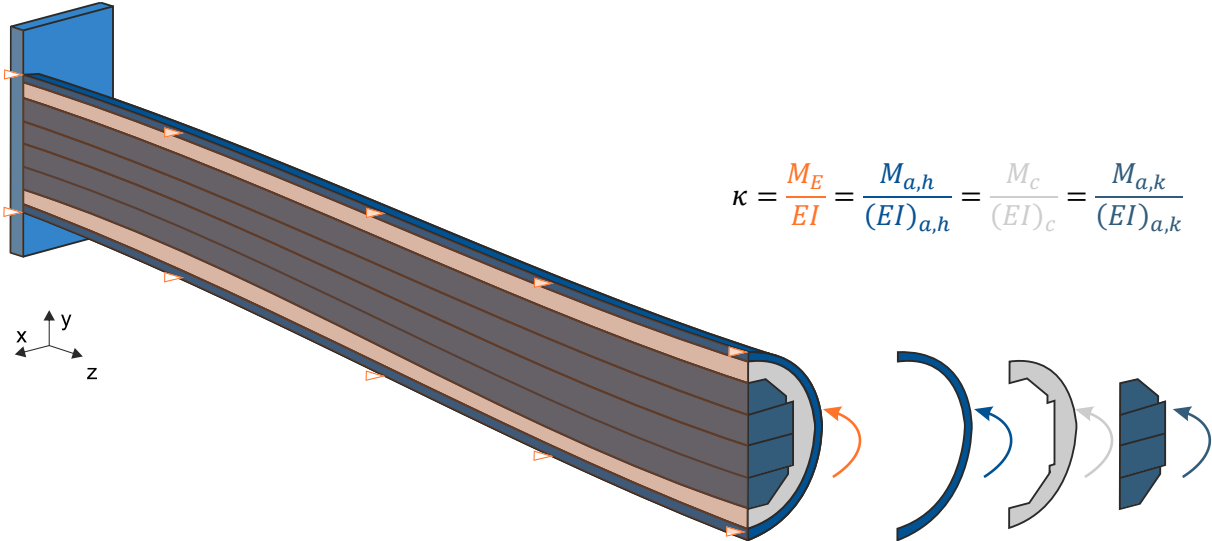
Moment-curvature relation (Index a,h: structural steel section, tube; c: concrete; a,k: structural steel section, core profile).
